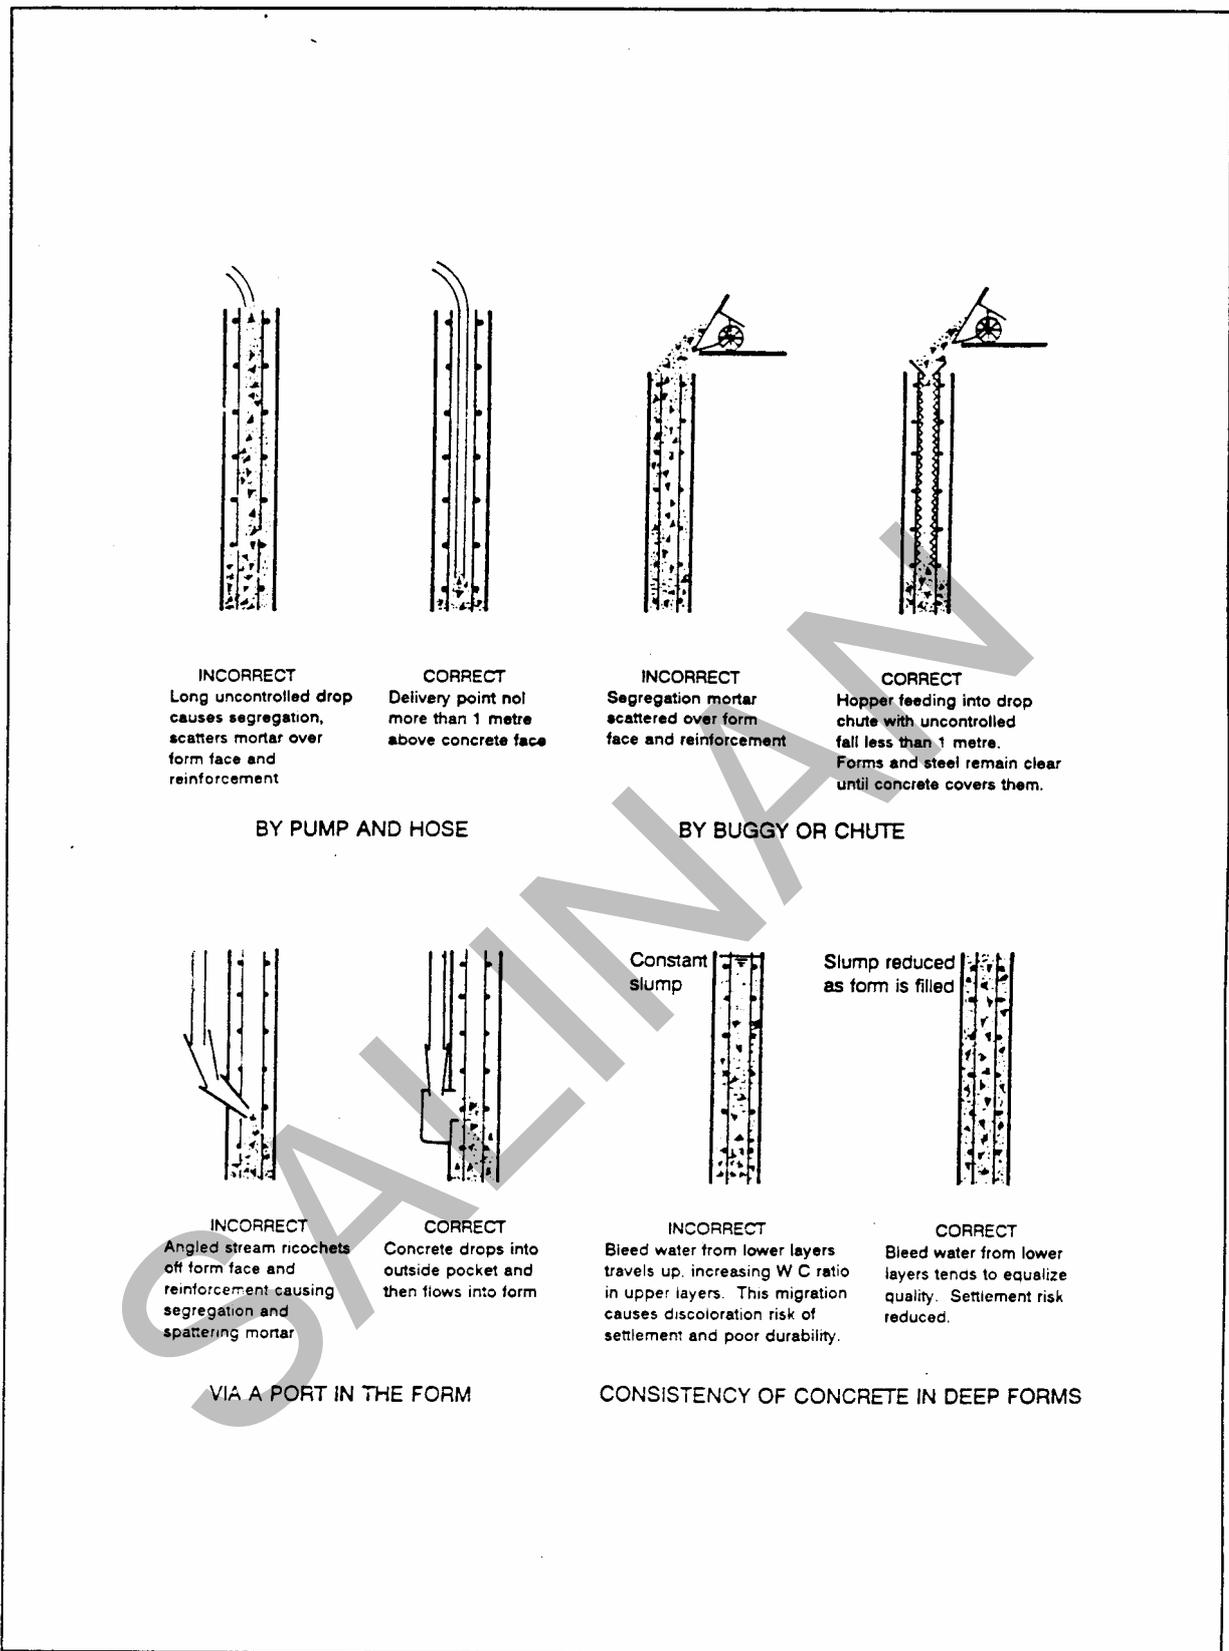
Placing Concrete in Deep Narrow Forms
